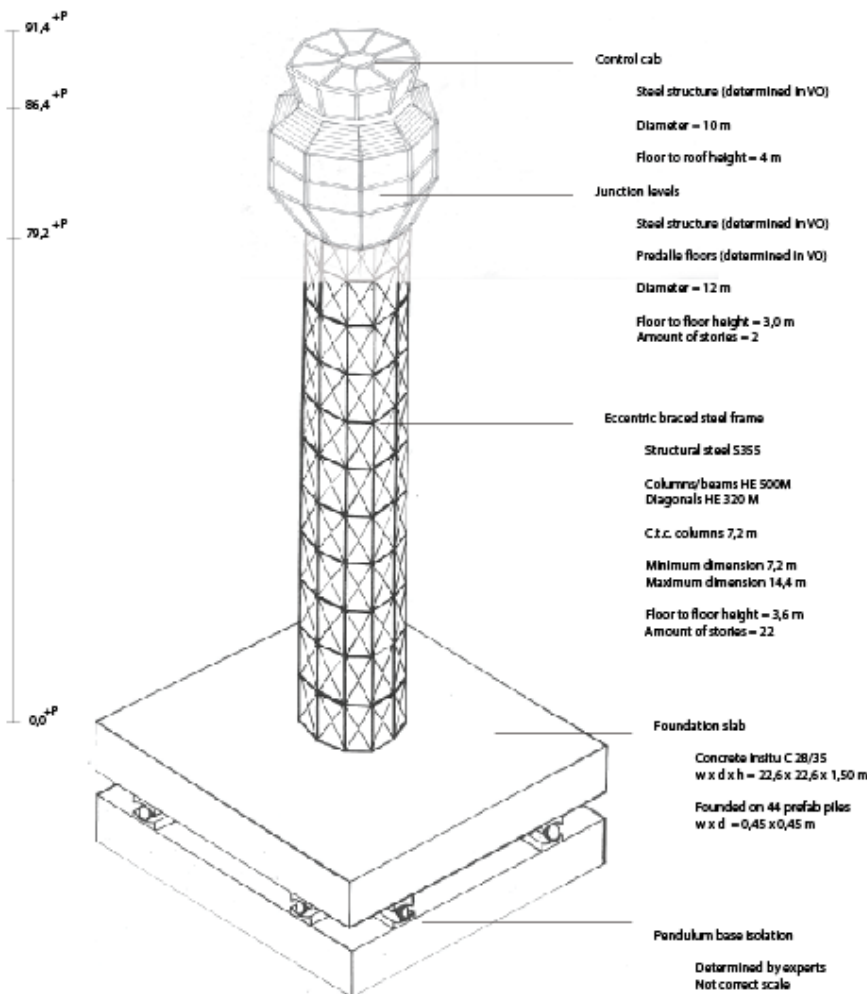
Concept design Tokyo airport, eccentric steel braced frame
